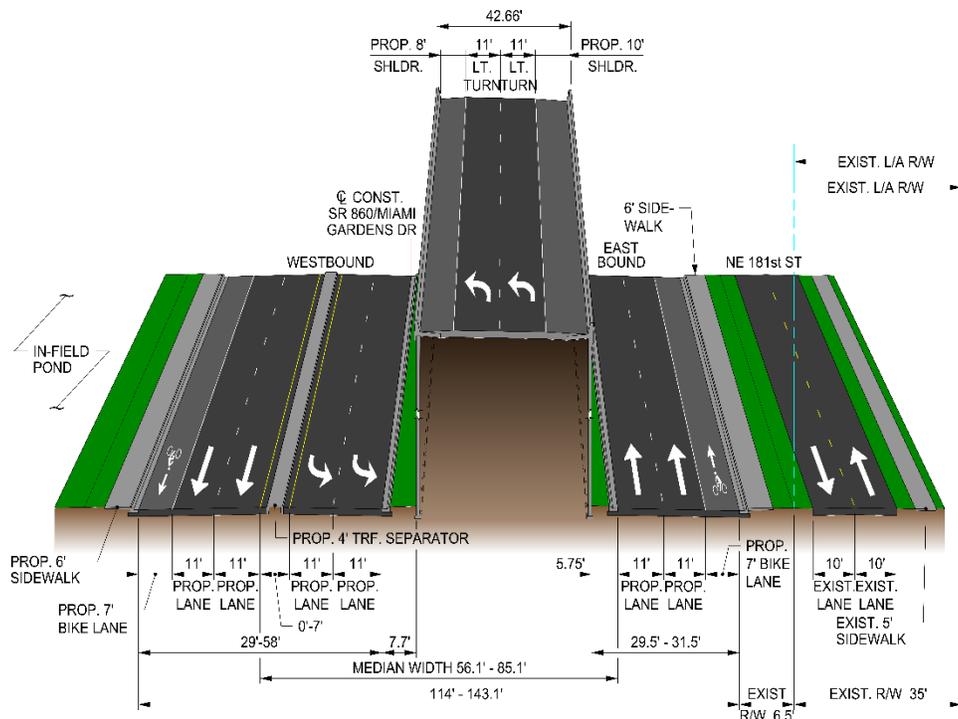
13: Proposed Typical Section - Alternative 3 – SR 860/Miami Gardens Drive
